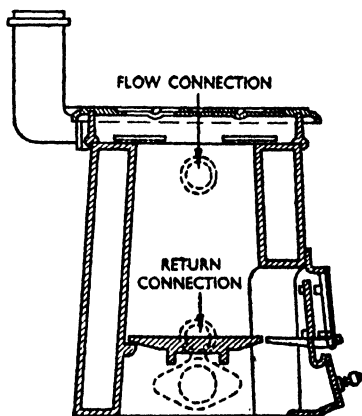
Typical design of independent boiler. The fire is situated inside the boiler and burns coke or anthracite.
